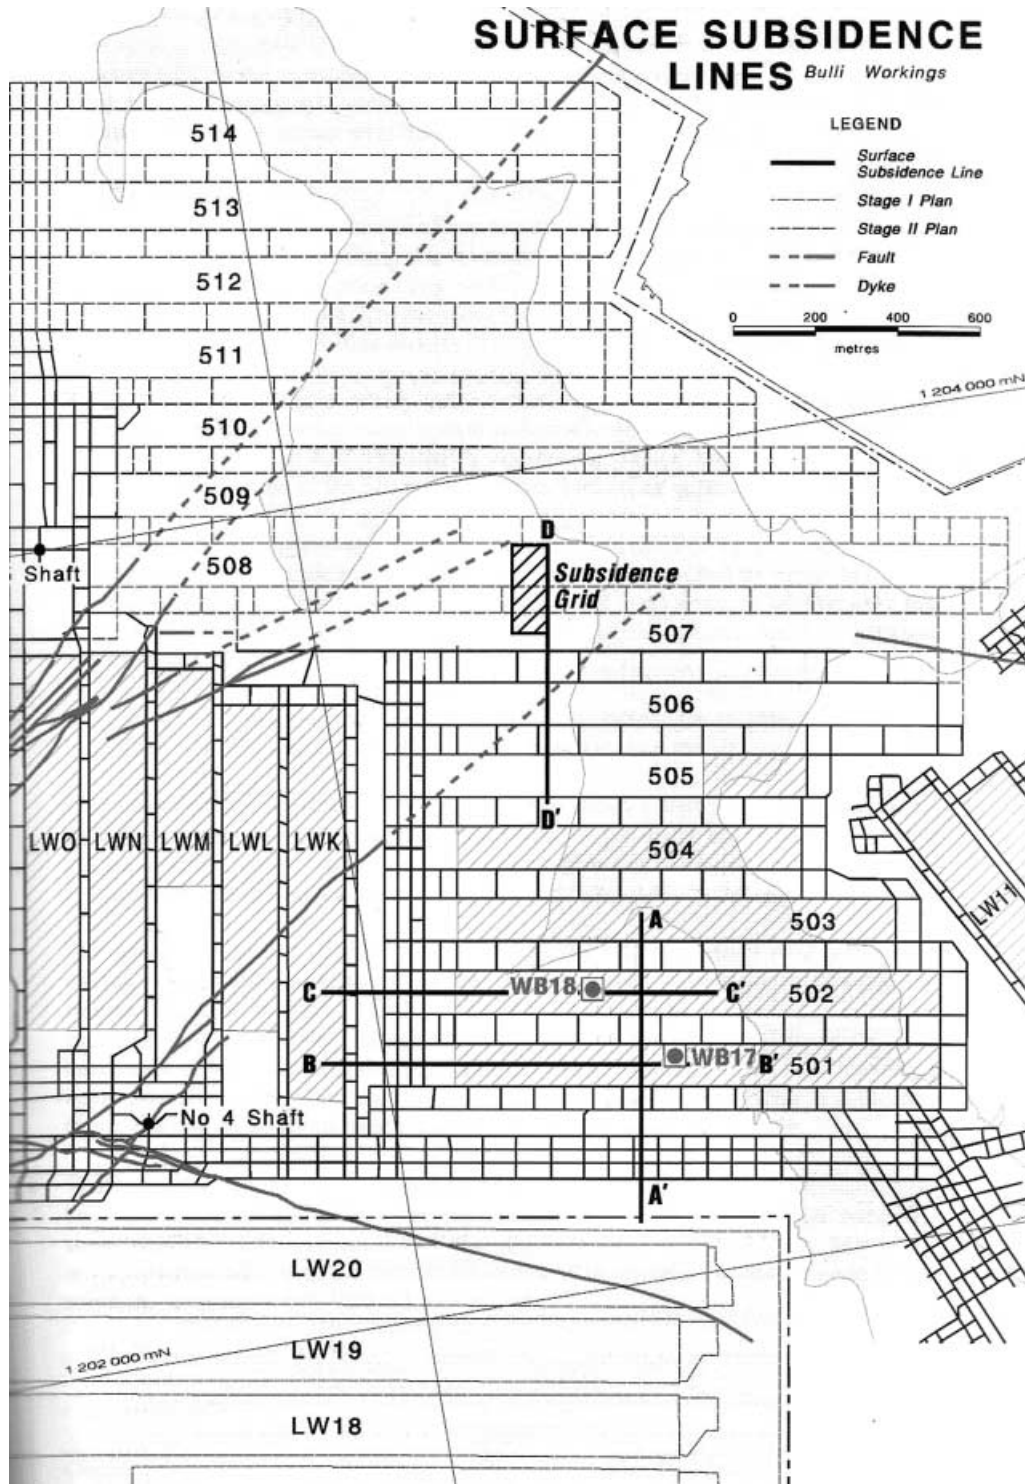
Layout of longwall faces under the Cataract Dam in Bellambi West Colliery
